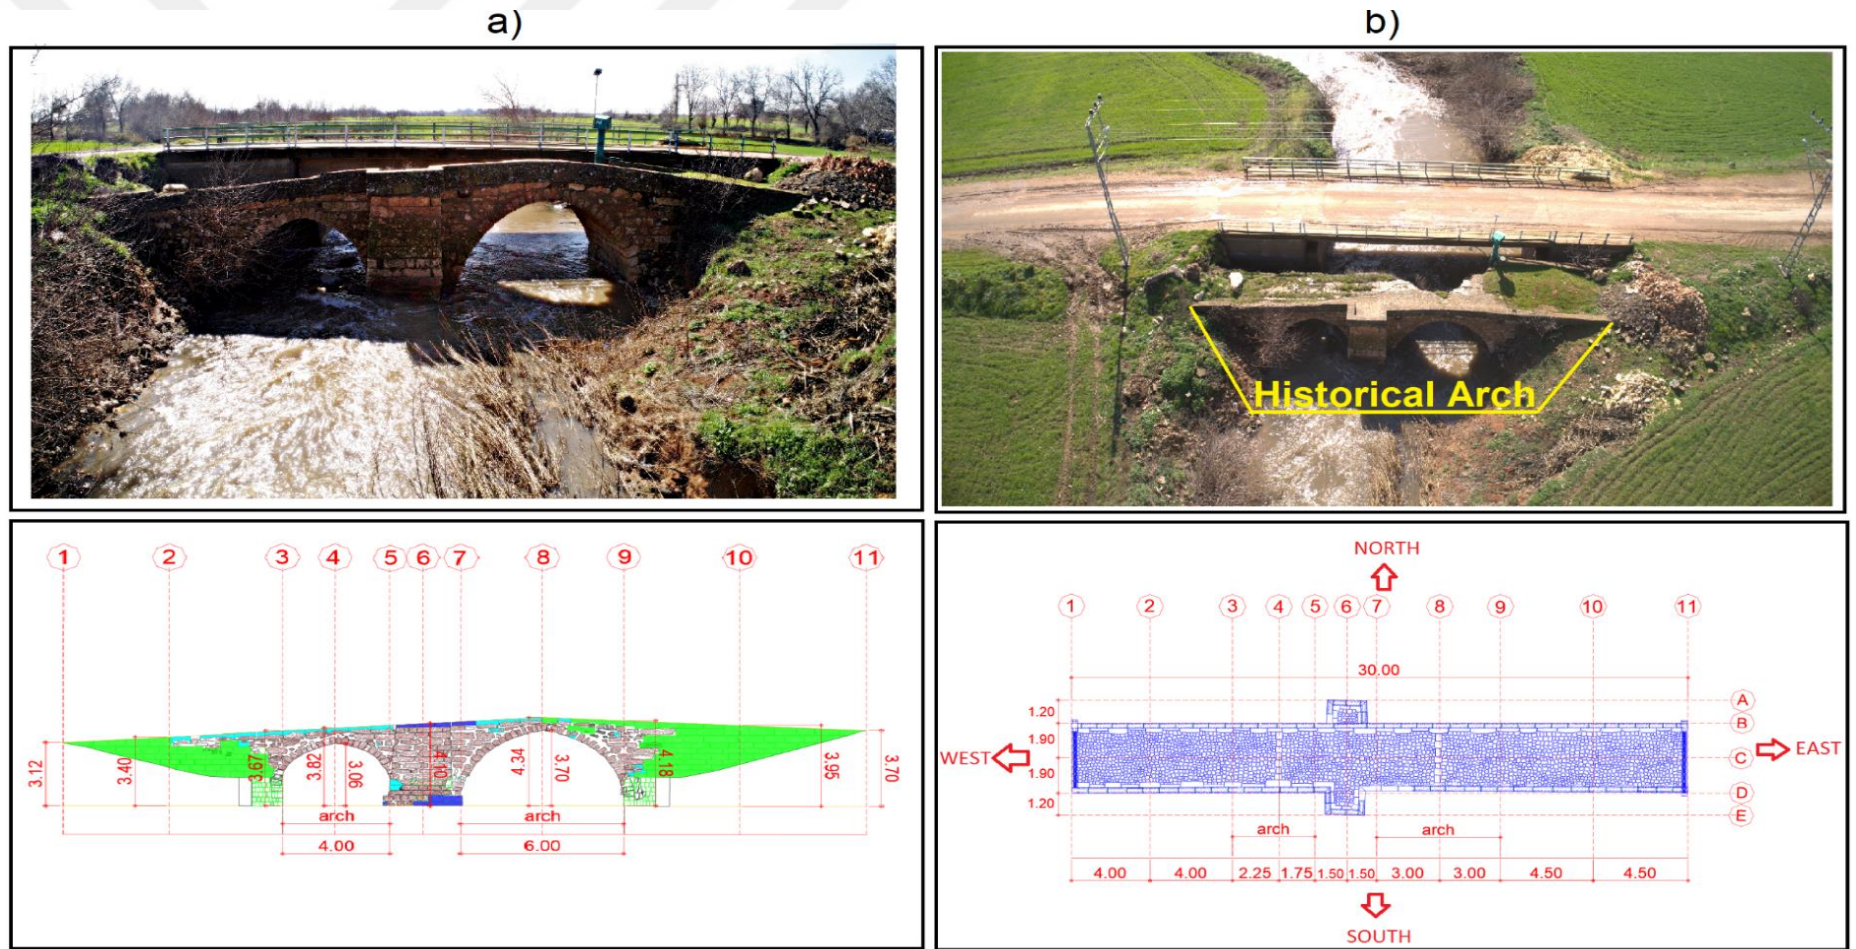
Investigated historical bridge in the study: a) General photograph of bridge, and front section views, b) Aerial photograph of bridge and top section views with dimensions of structural parts in west and north (modified from) [110].
